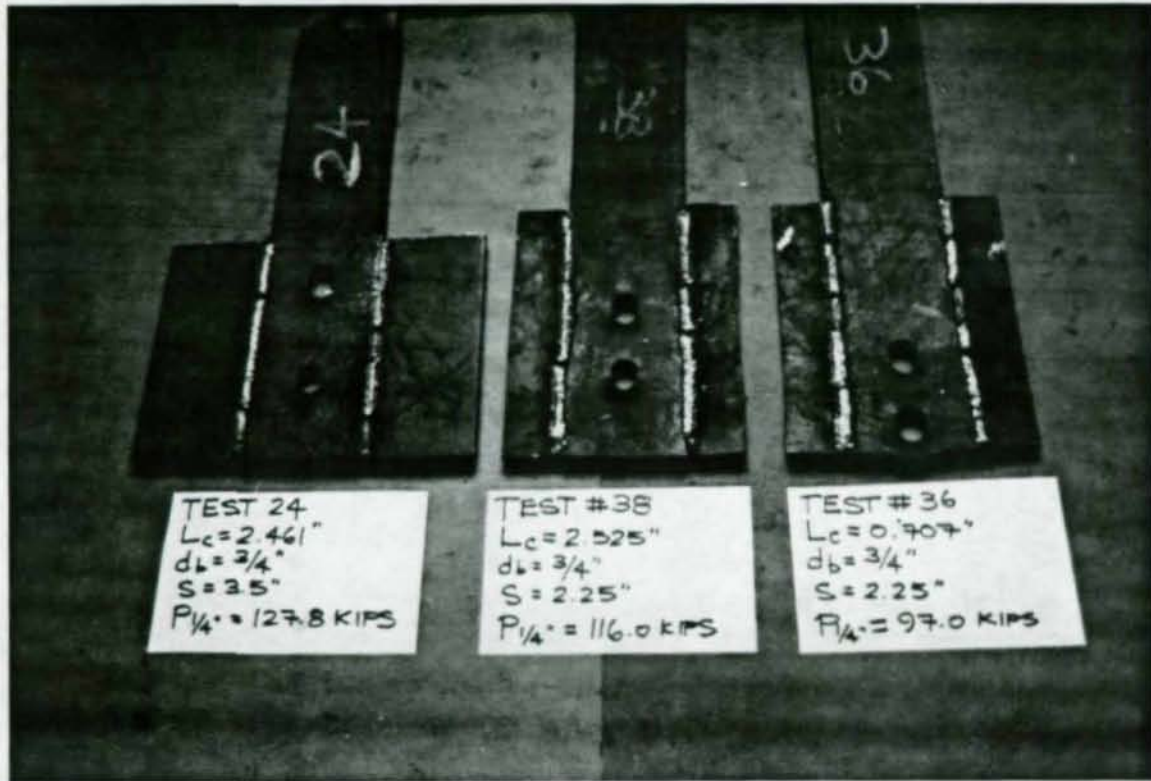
Specimens Built with 3/4 in. Diameter Bolts and Capable of Resisting a Bearing Stress of $2.4F_u$ According to the AISC/LRFD. Only the specimen with 3.5 in. bolt spacing and 2.461 clear end distance is capable of resisting $2.4F_u$ at 1/4 in. deformation.
